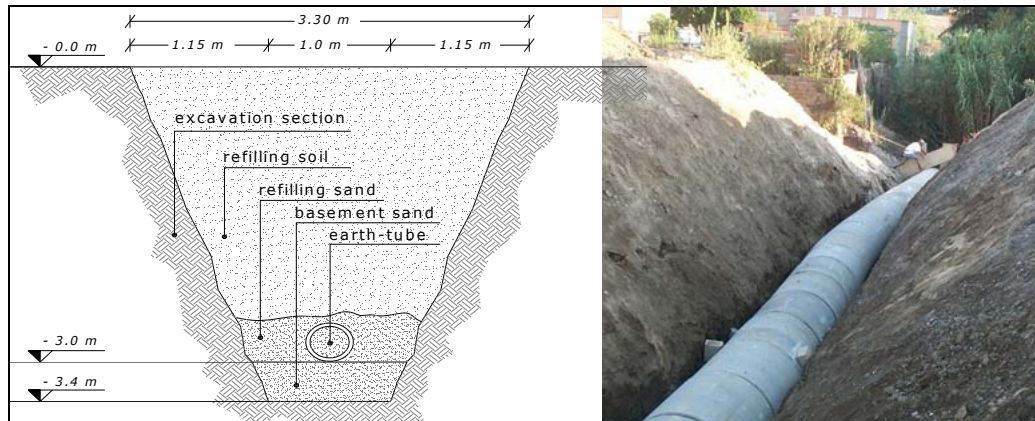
Earth tube installation: soil excavation and refilling
